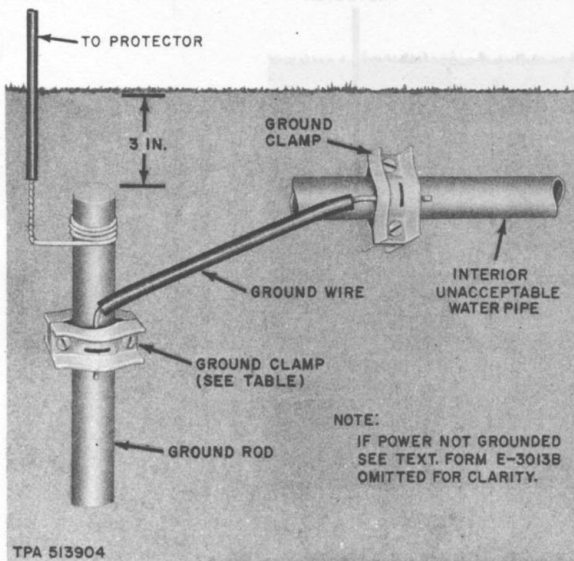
Power not Grounded on Premises—Unacceptable Water Pipe
